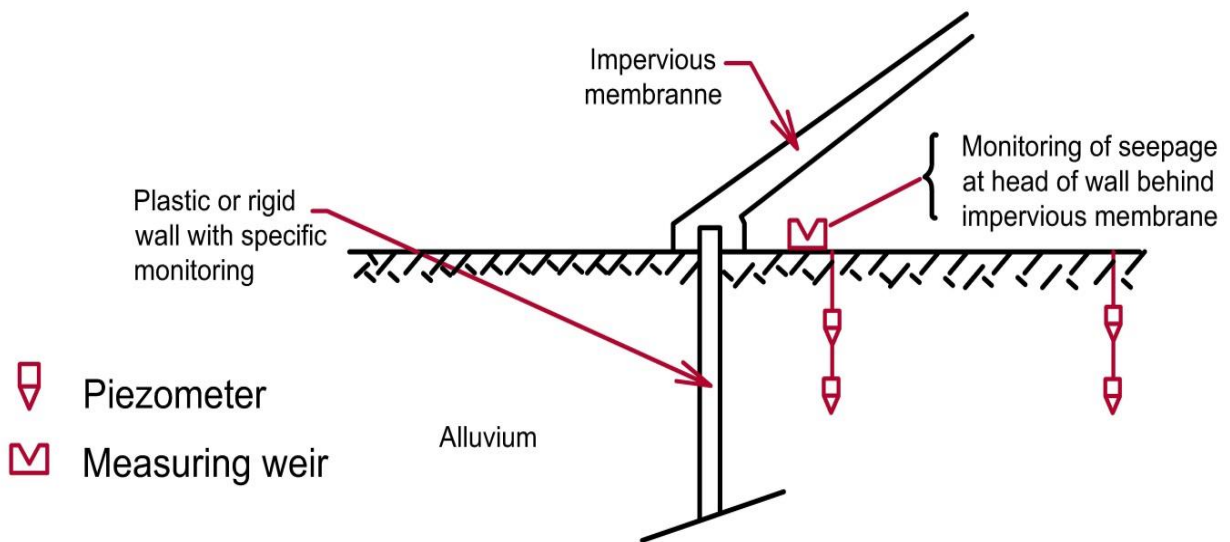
Impervious Membrane Dam with Cutoff Wall – Positioning of Pore pressure Sensors
